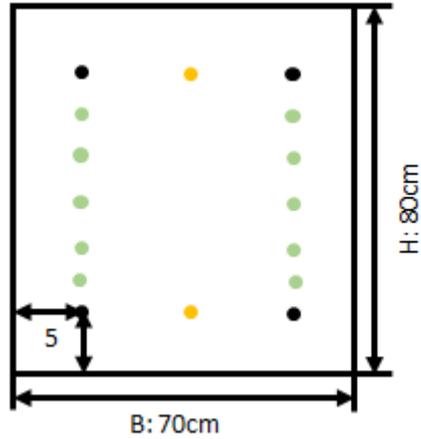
example of parametrized RC section; B for width, H for height, yellow dots for width-span rebar, and green dots for height-span rebar
